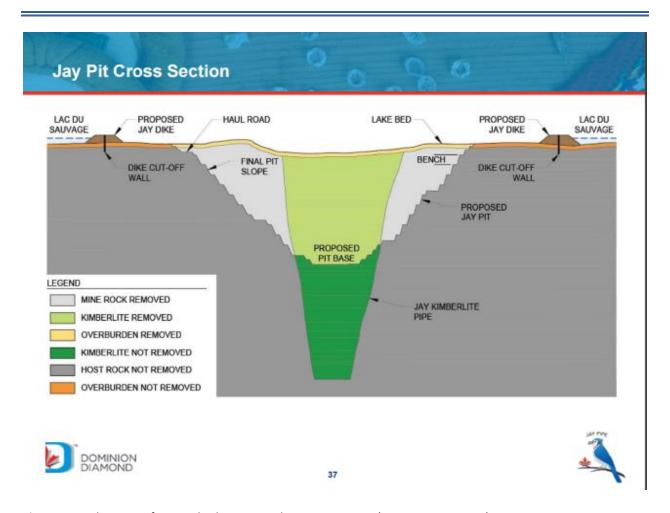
Schematic of Jay Kimberlite pipe and pit cross section (Source PR#236 p37)
